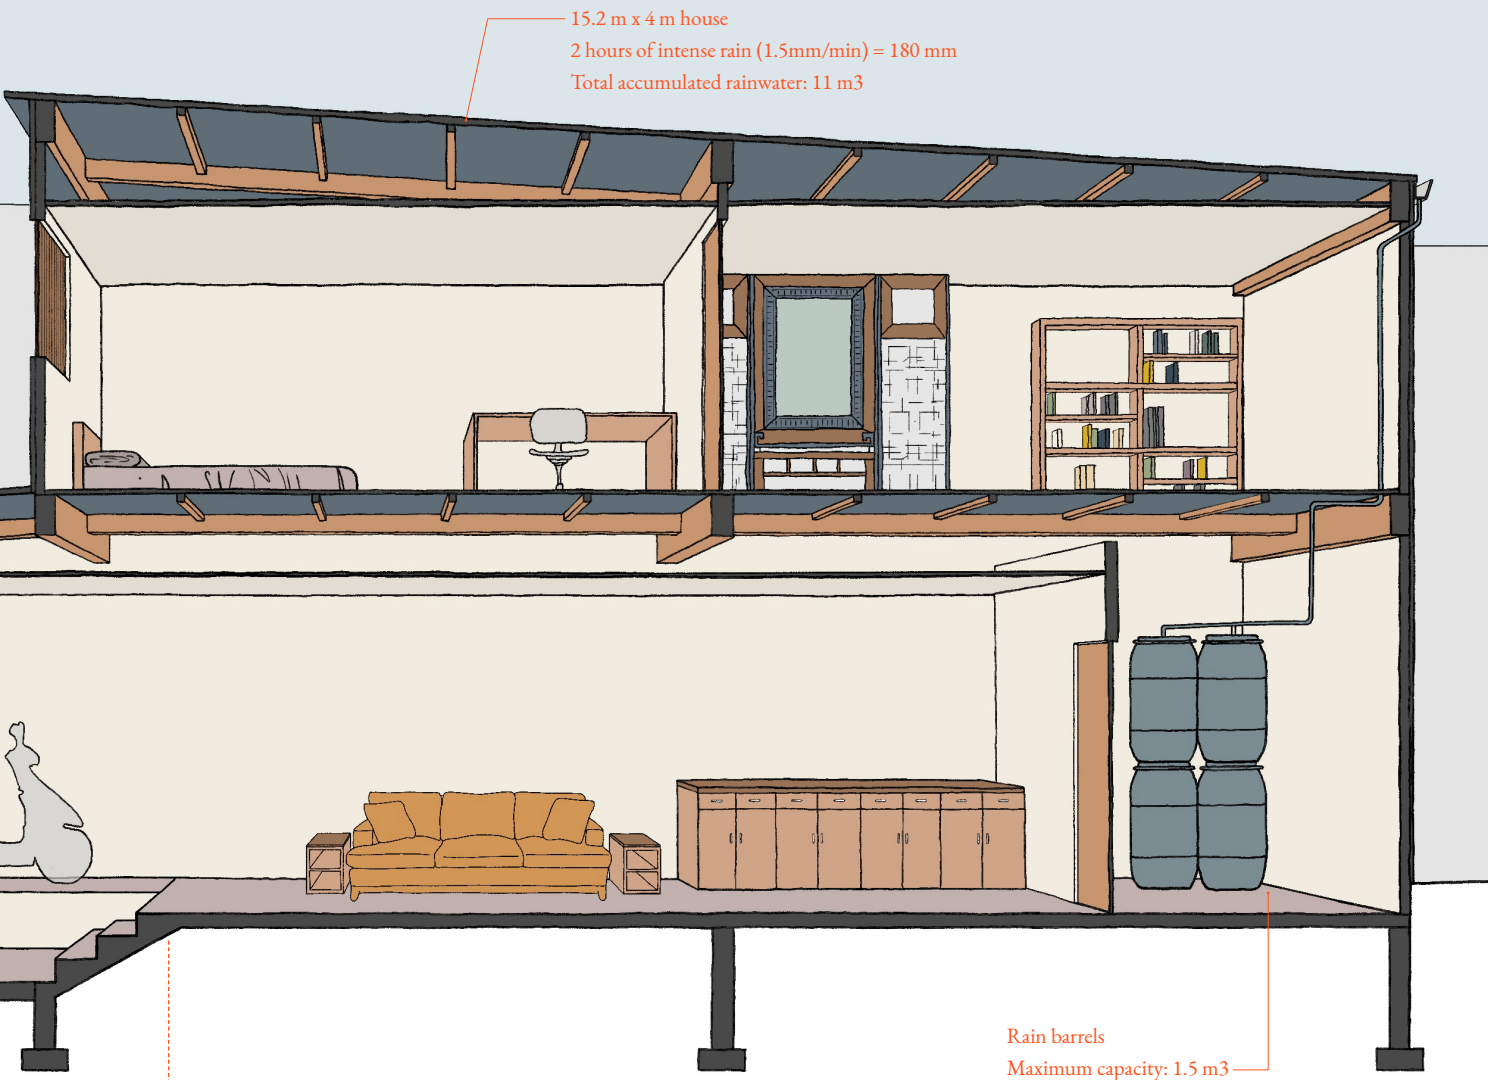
Section of retrofitted alleyway house without front yard in dry condition.
